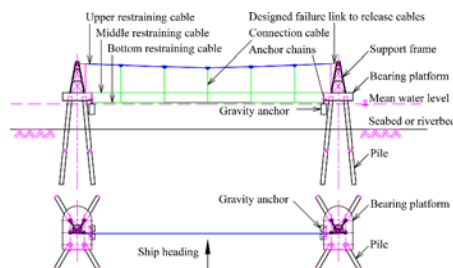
Front elevation and plan of a single unit of overhead retardation system
